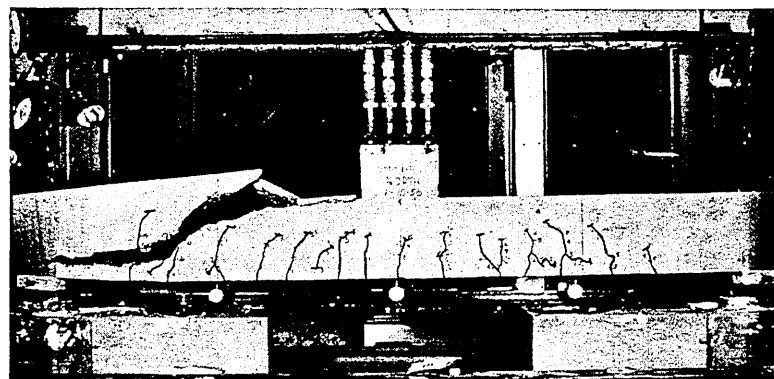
CRACK DEVELOPMENT FOR SHEAR-COMPRESSION FAILURE. BEAM B-12
